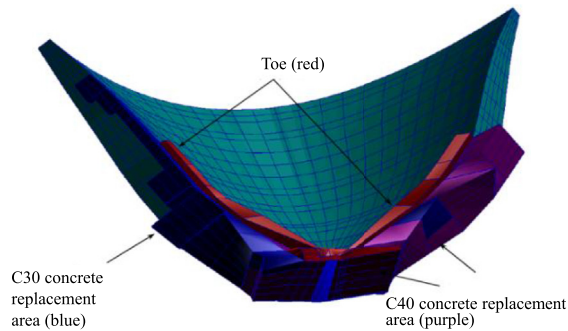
Sketch of relation among foundation concrete replacement, toe protection, and dam.
